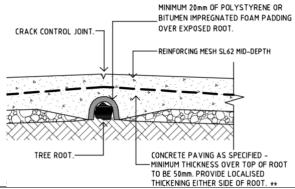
Image B: Example method for bridging concrete surfacing over tree roots provided in the Canterbury Bankstown Council standard drawings.⁹
